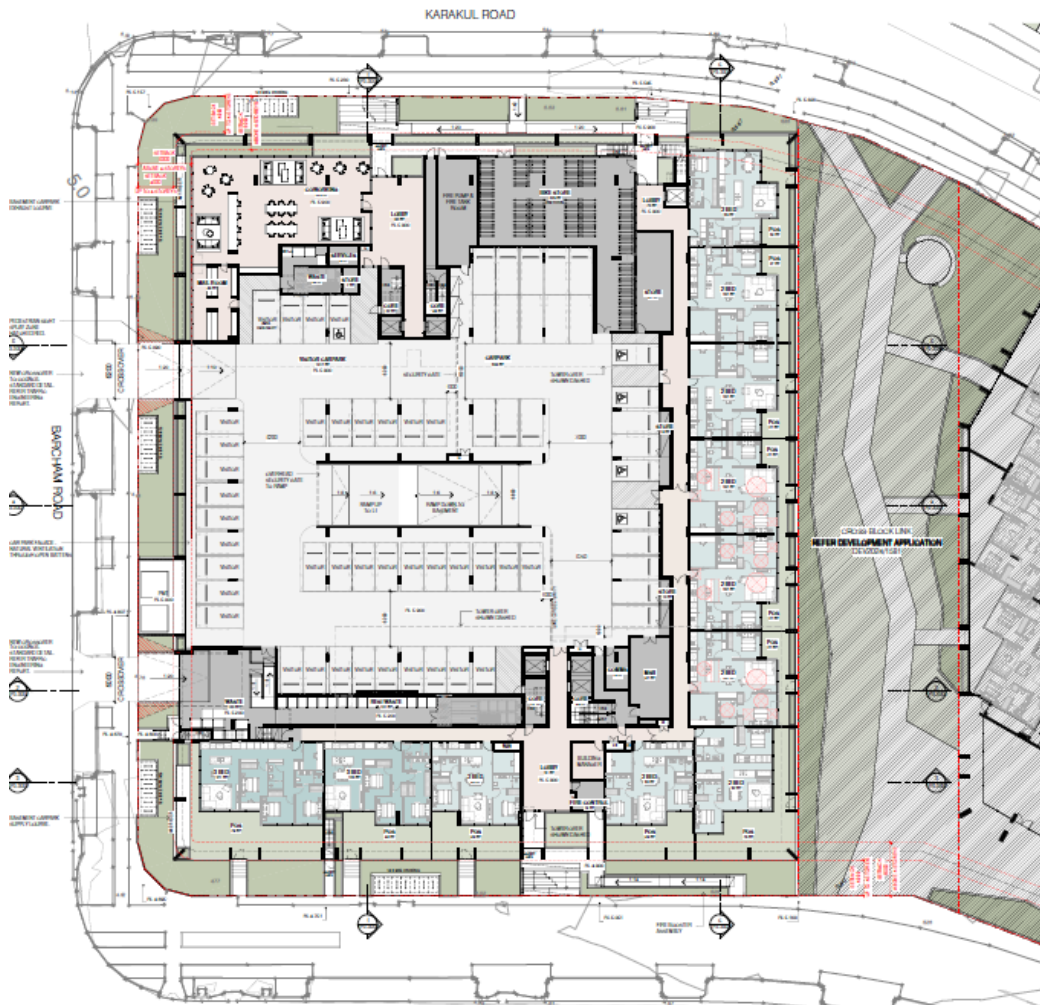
Extract from proposed development plan at ground level Site 18B (Carr 24047-TP3-1002).
